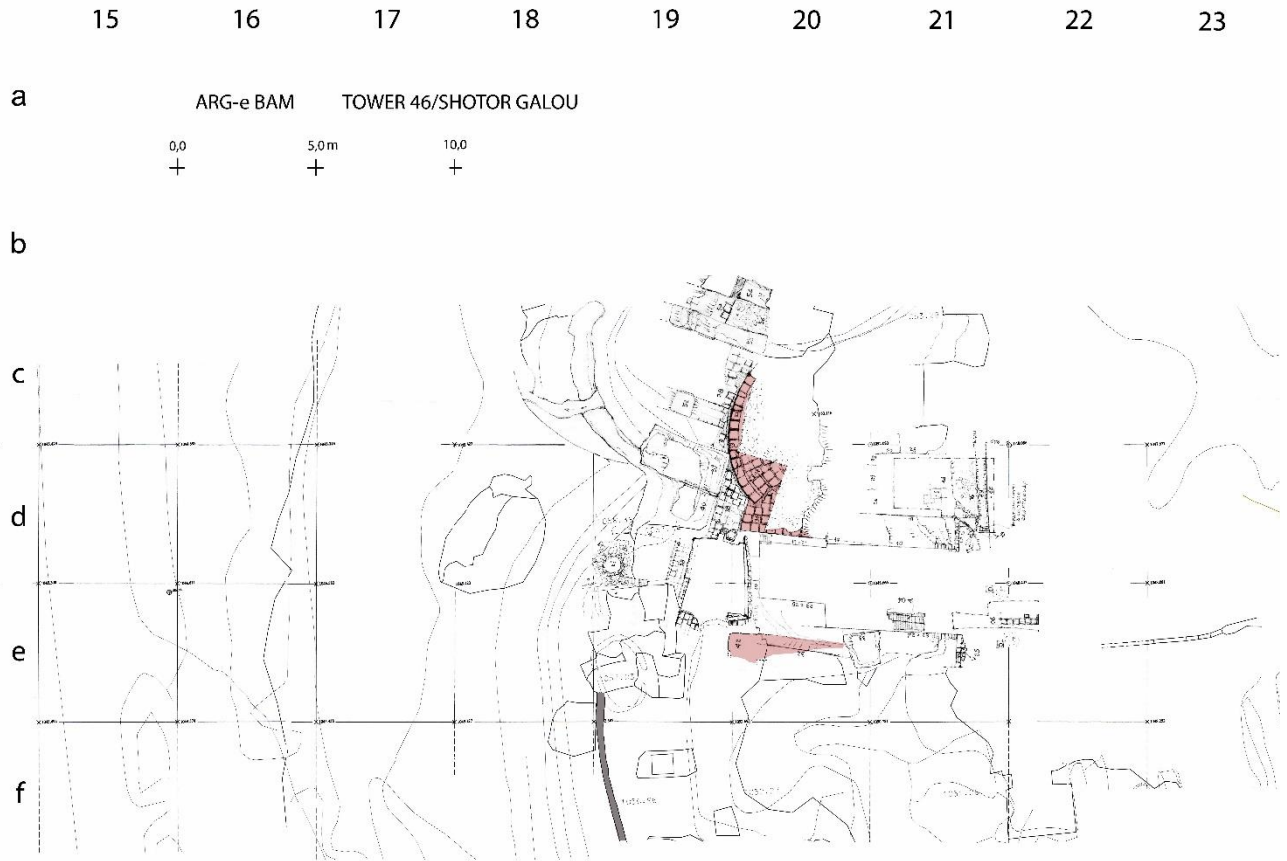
Plan of west city gate and adjacent tower indicated in light brown (plan Vincenzo Torrieri).
